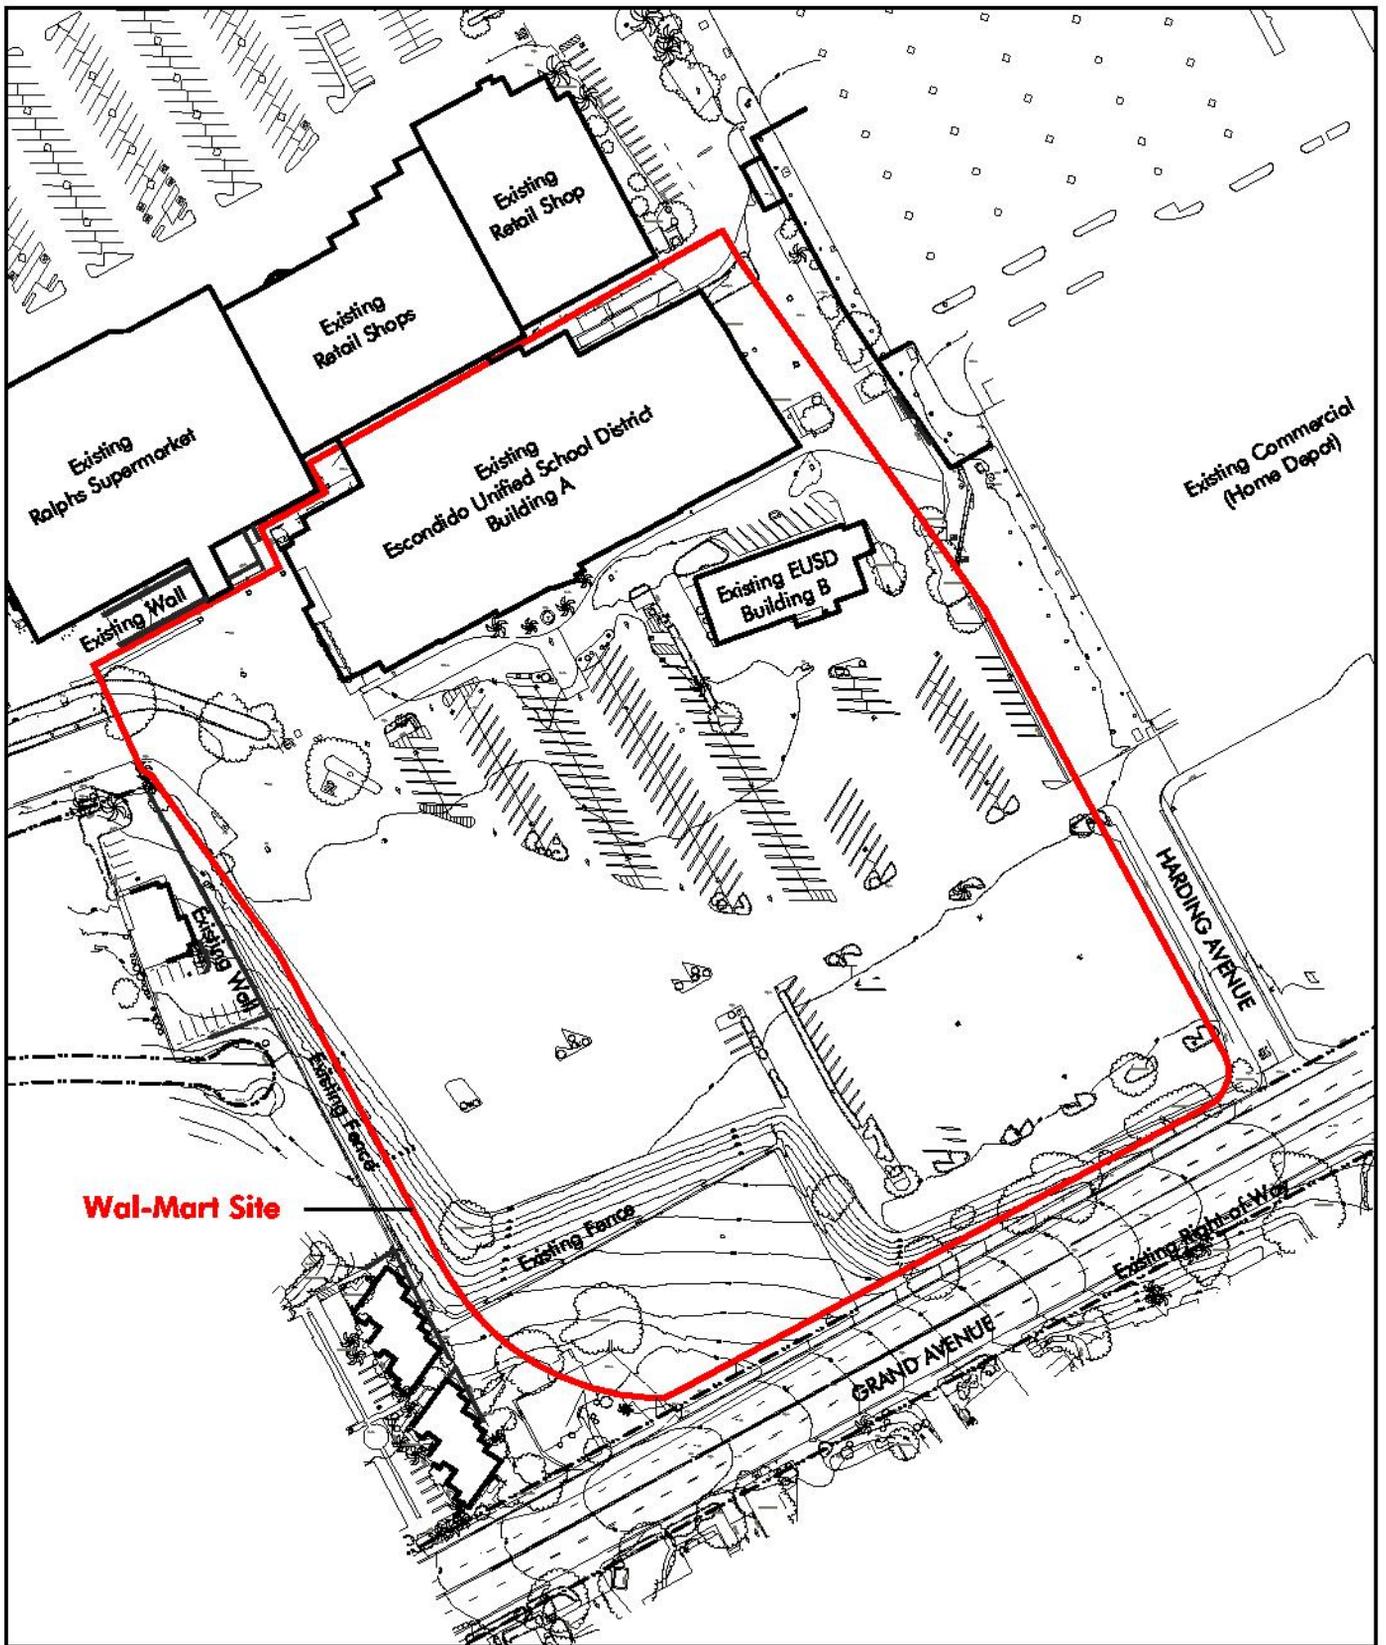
B-4 shows the existing site topography, which has been altered by previous grading on the property and is relatively flat. The average elevation is approximately 671.5 feet AMSL with southwesterly drainage toward the flood control channel.
